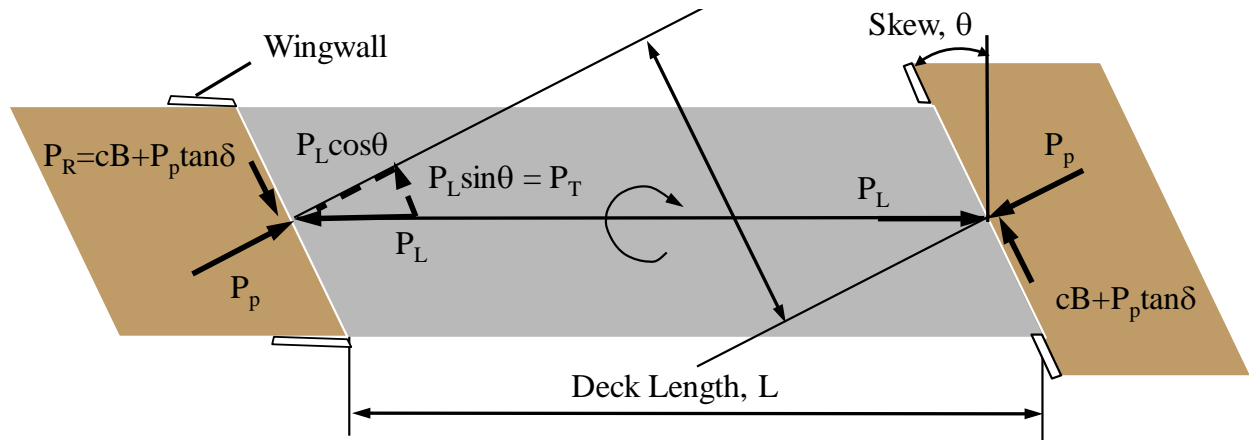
Typical Distribution of Forces on a Bridge with a Skewed Abutment
